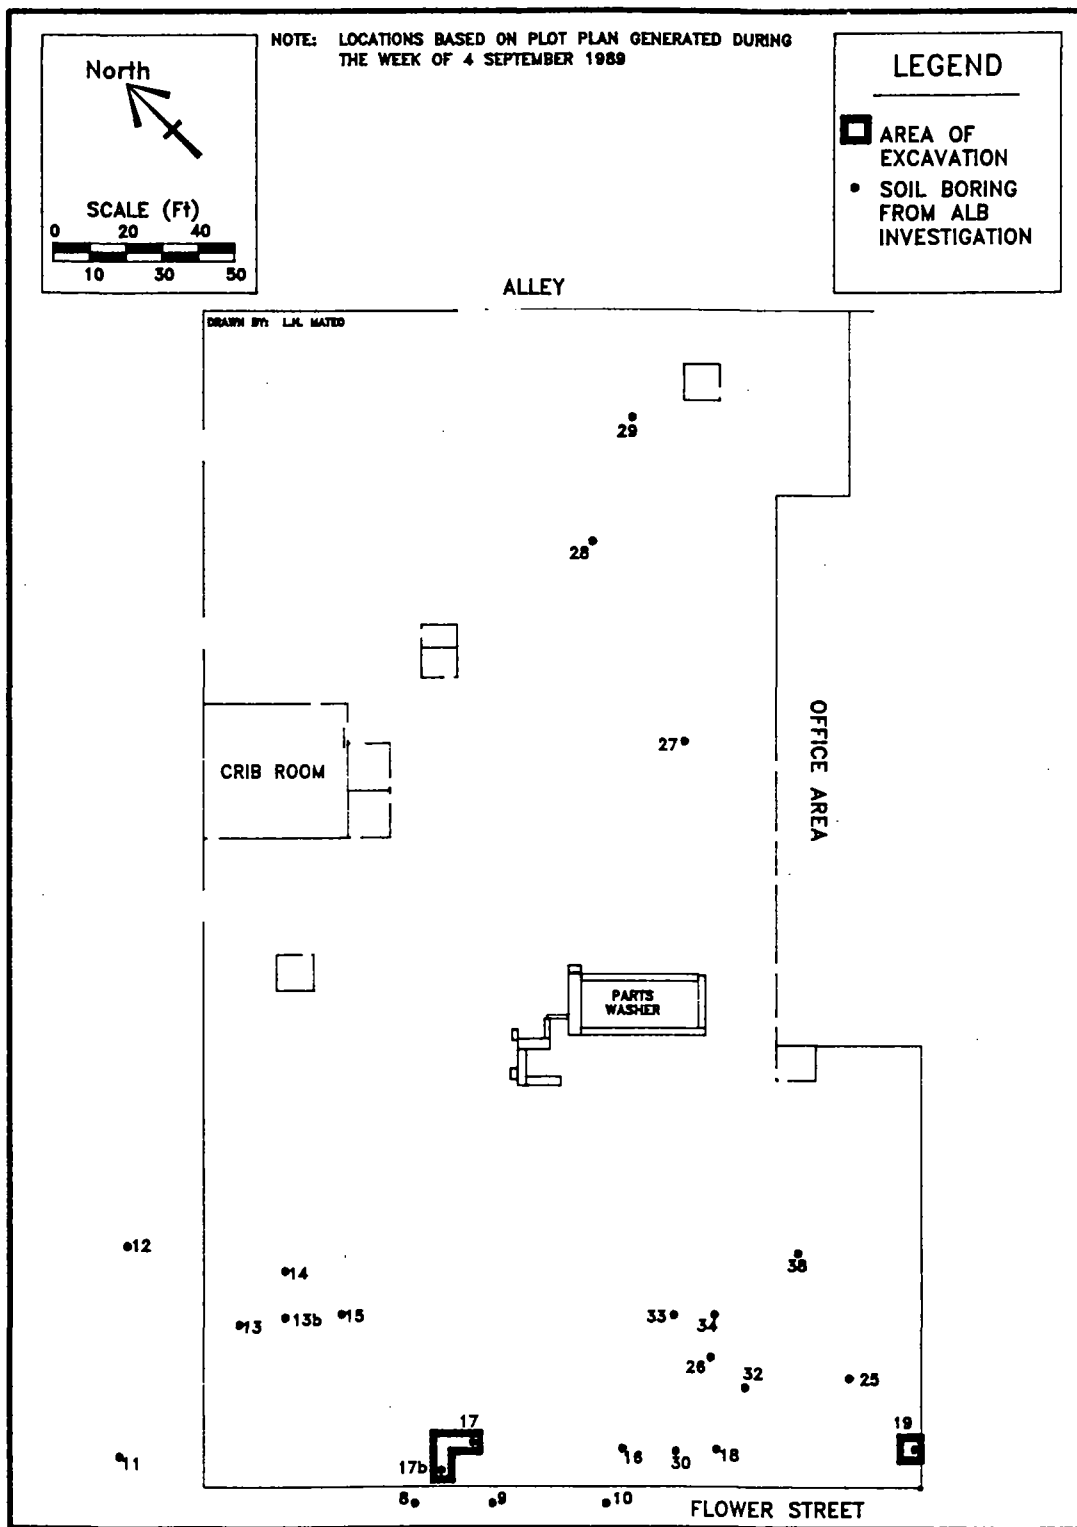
LOCATIONS OF PREVIOUS SOIL BORINGS IN BUILDING 2
